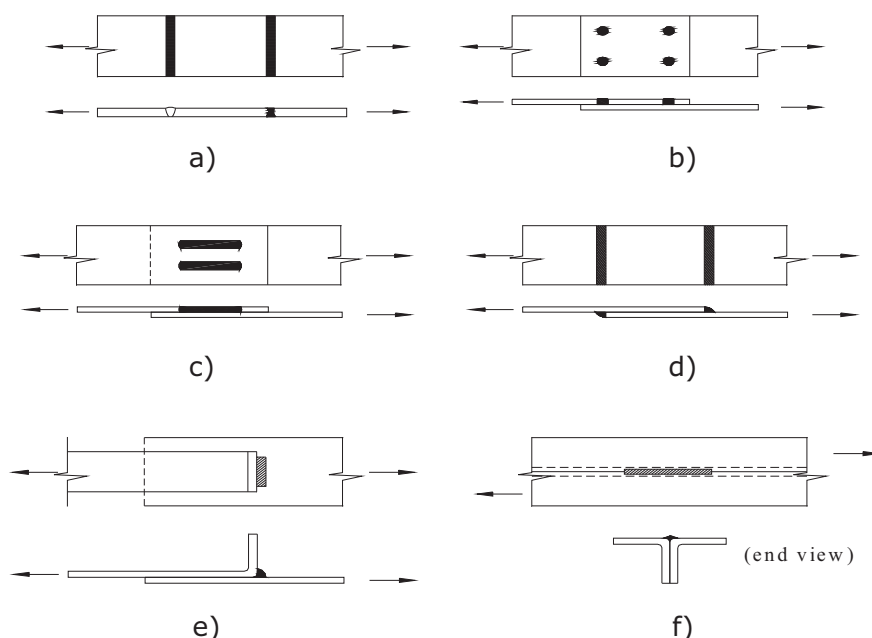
Types of arc (fusion) welds (Yu, 2000): (a) Groove welds in butt joints; (b) Arc spot weld (puddle weld); (c) Plug and slot welds; (d) Fillet welds; (e) Flare bevel groove weld; (f) Flare V-grove weld
